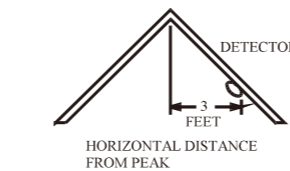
RECOMMENDED LOCATION TO MOUNT SMOKE ALARMS IN ROOMS WITH SLOPED, GABLED, OR PEAKED CEILING
